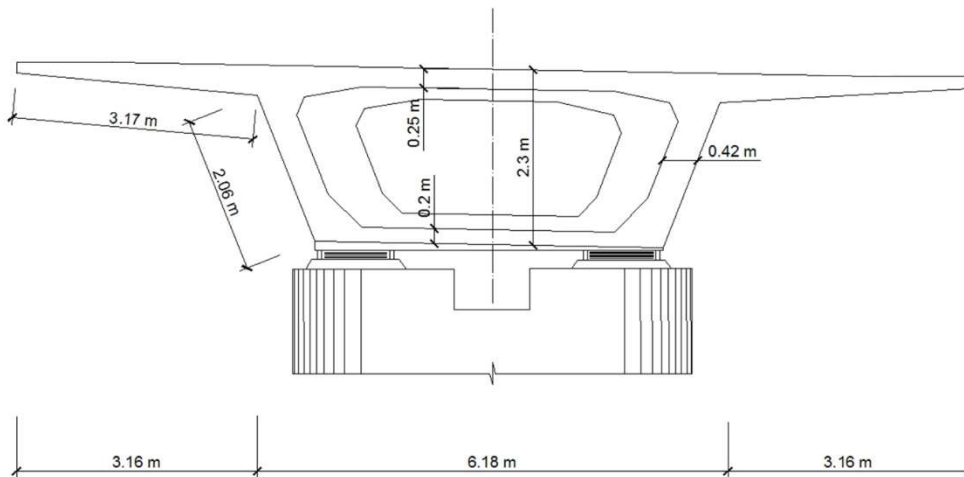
Cross section of the Arosa's concrete bridge deck
